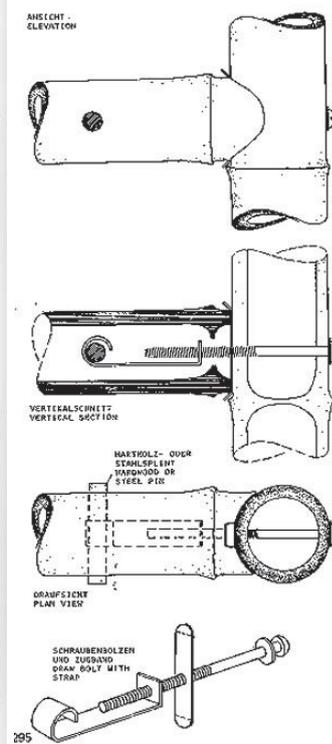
Plugin Connection (Steel Tension Clamp)
